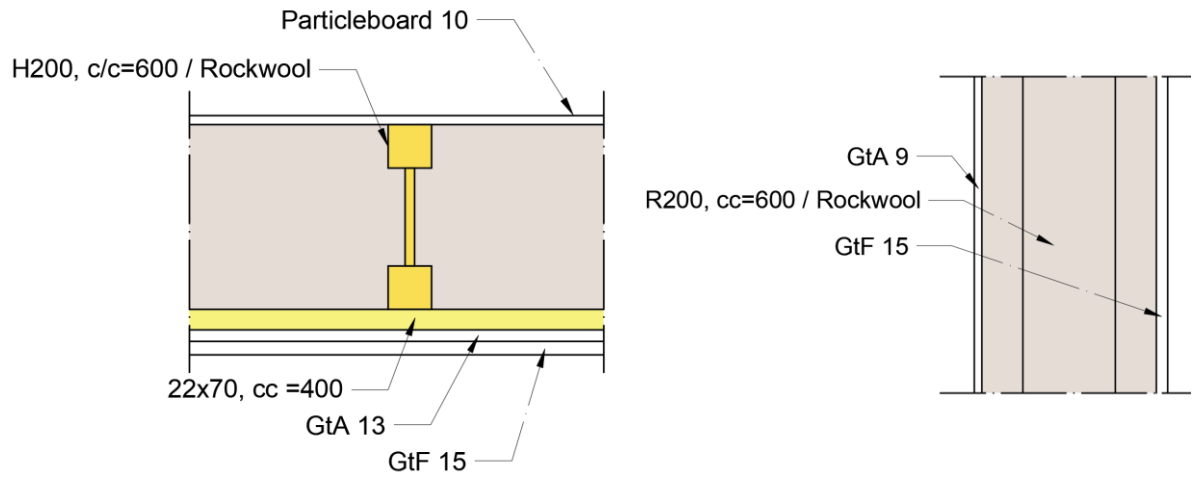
LEFT: Ceiling section; RIGHT: Wall section
